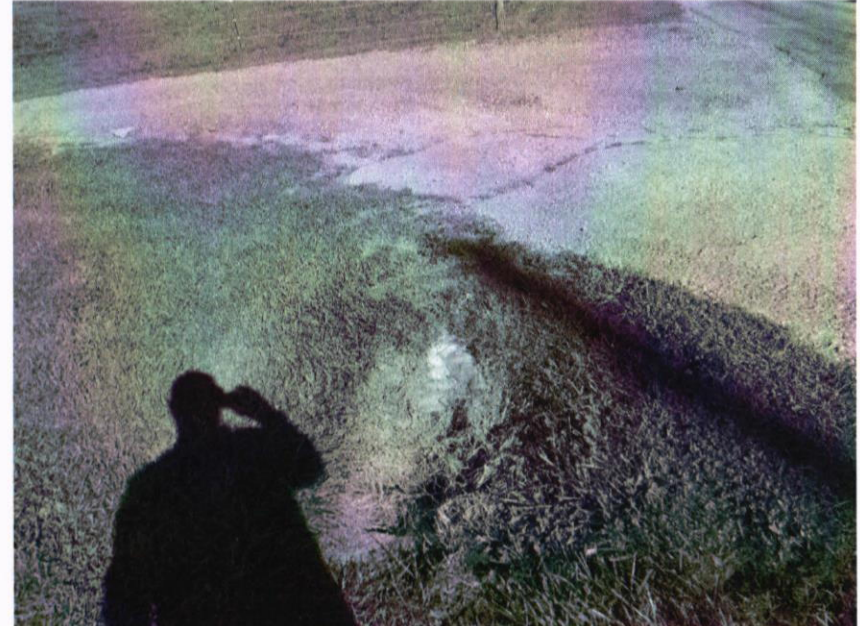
Facing north towards corrugated metal drainage pipe inlet (partially buried and crushed) that is buried under the private driveway.
